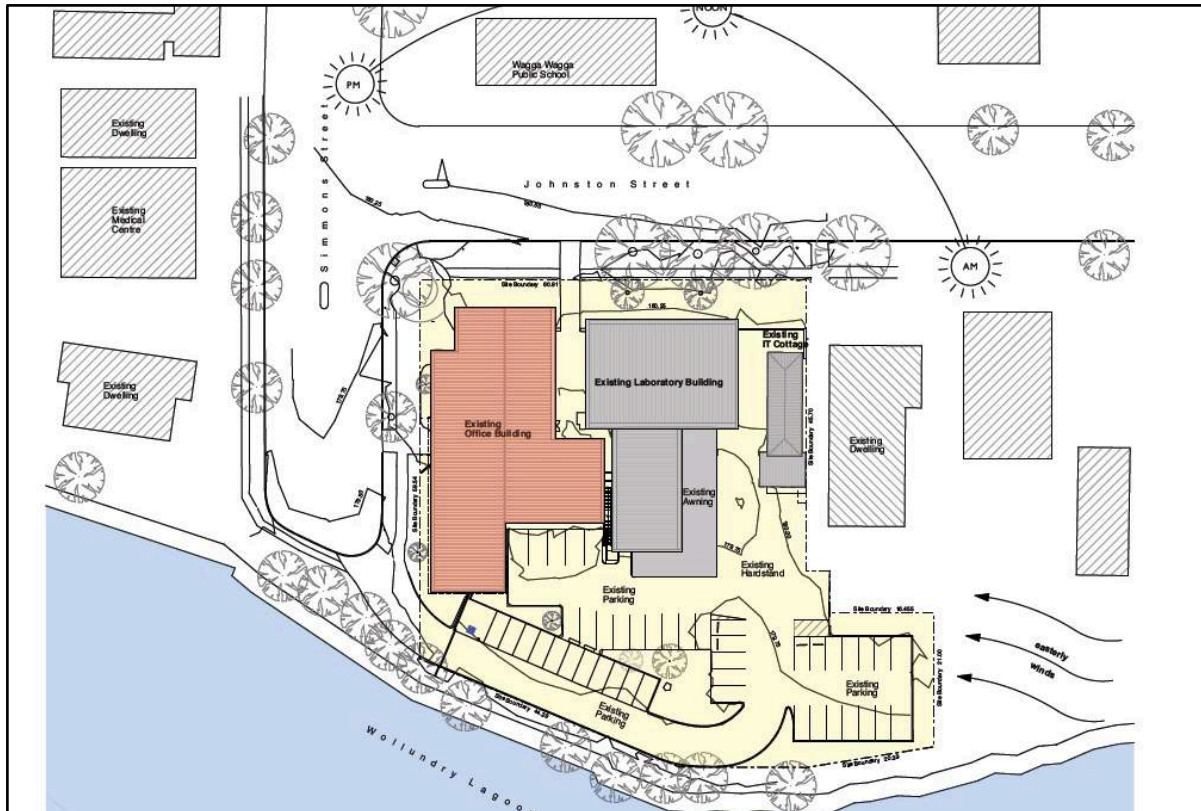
Extract from Site Analysis Plan (Source: Stanton Dahl Architects 2020)
